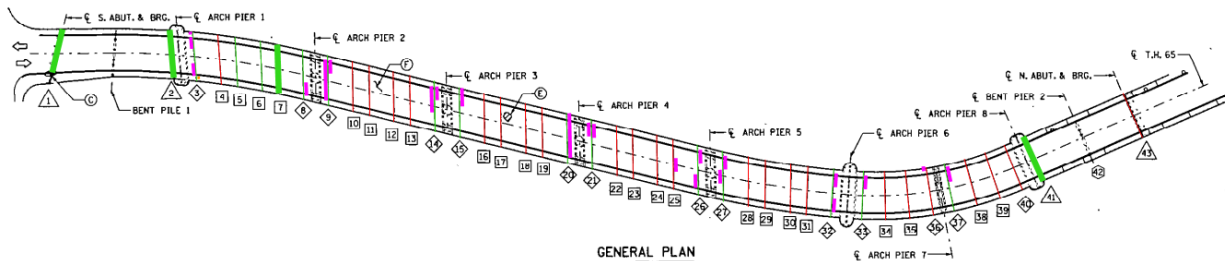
Plan view indicating locations of cap beam spalling, overlaid on joint movement diagram (purple indicates spall location).
